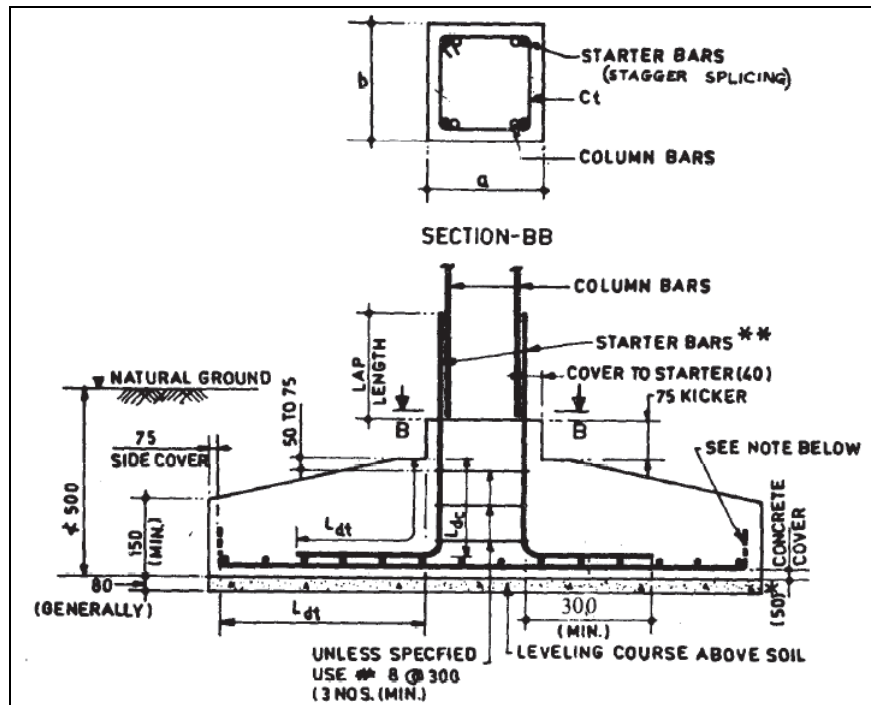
Typical detailing (section) of an isolated footing as described in SP 34
